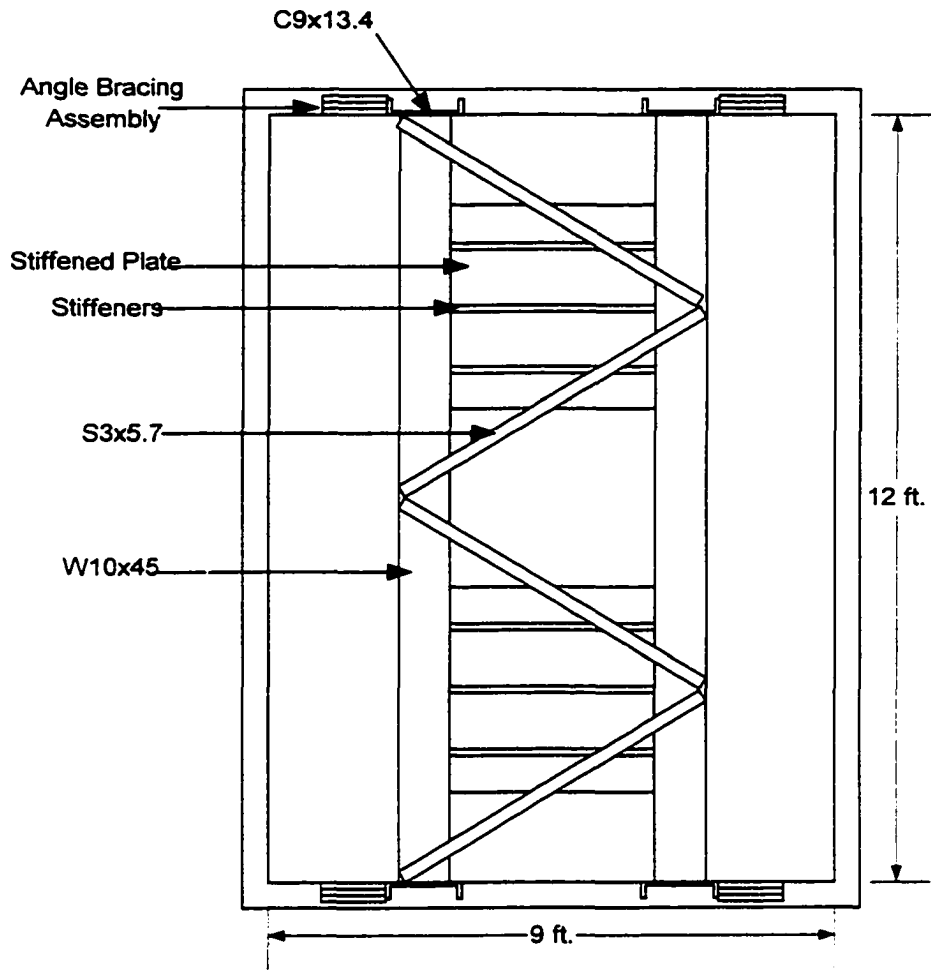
Plan View of Experimental Facility for Testing Small-Scale Piles
